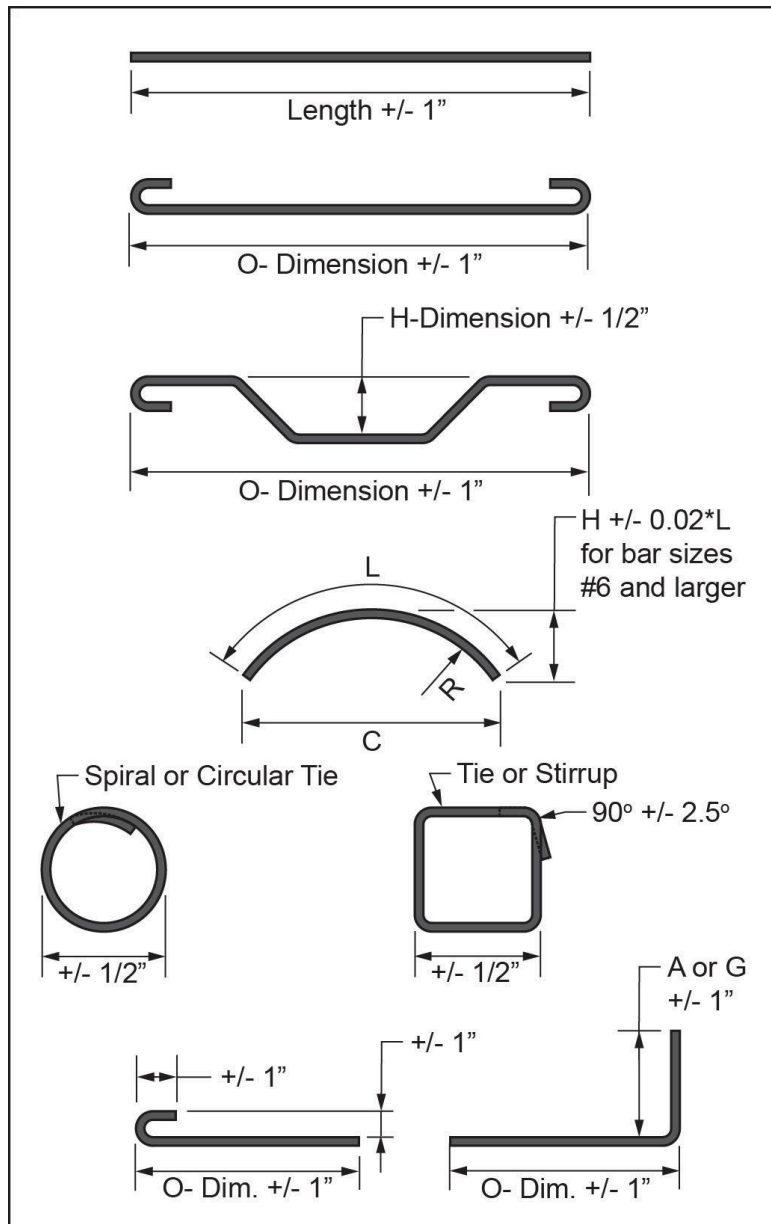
Standard Fabrication Cutting and Bending Tolerances
